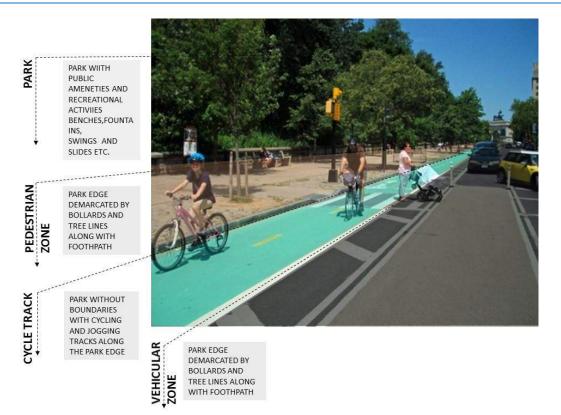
PROPOSED DESIGN OF EDGE CONDITION- TYPICAL PLAN
